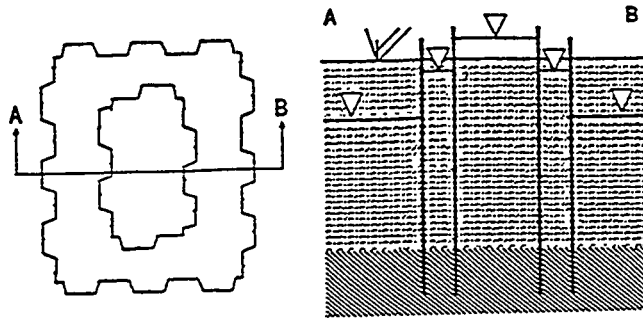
Plan and section view of test cell used to conduct hydraulic testing (after Starr and Cherry, 1992).
